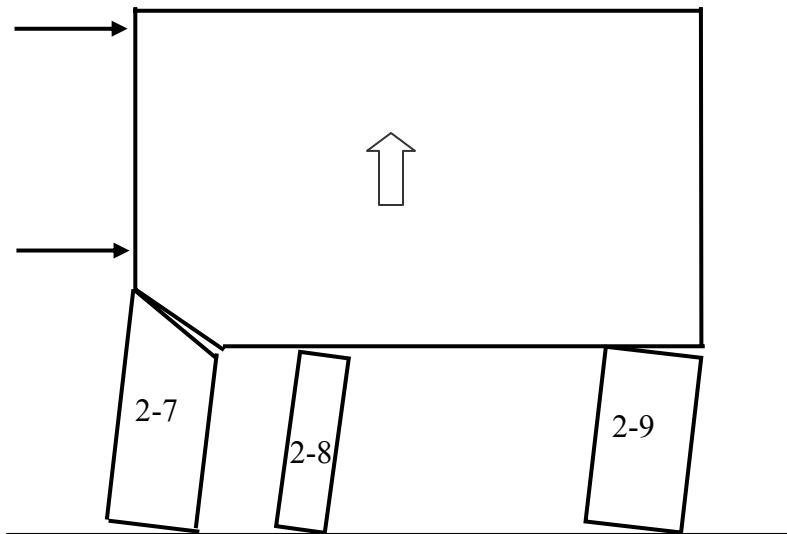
Rocking of the first floor piers in Wall 2 and upward movement of the second story wall
